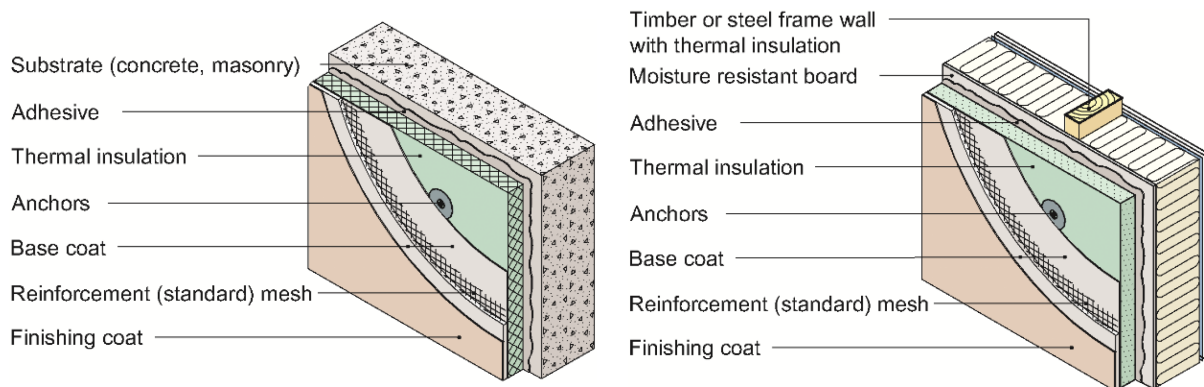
Example of a typical ETICS composition for masonry/concrete and lightweight timber walls (Kvande et al., 2018)
